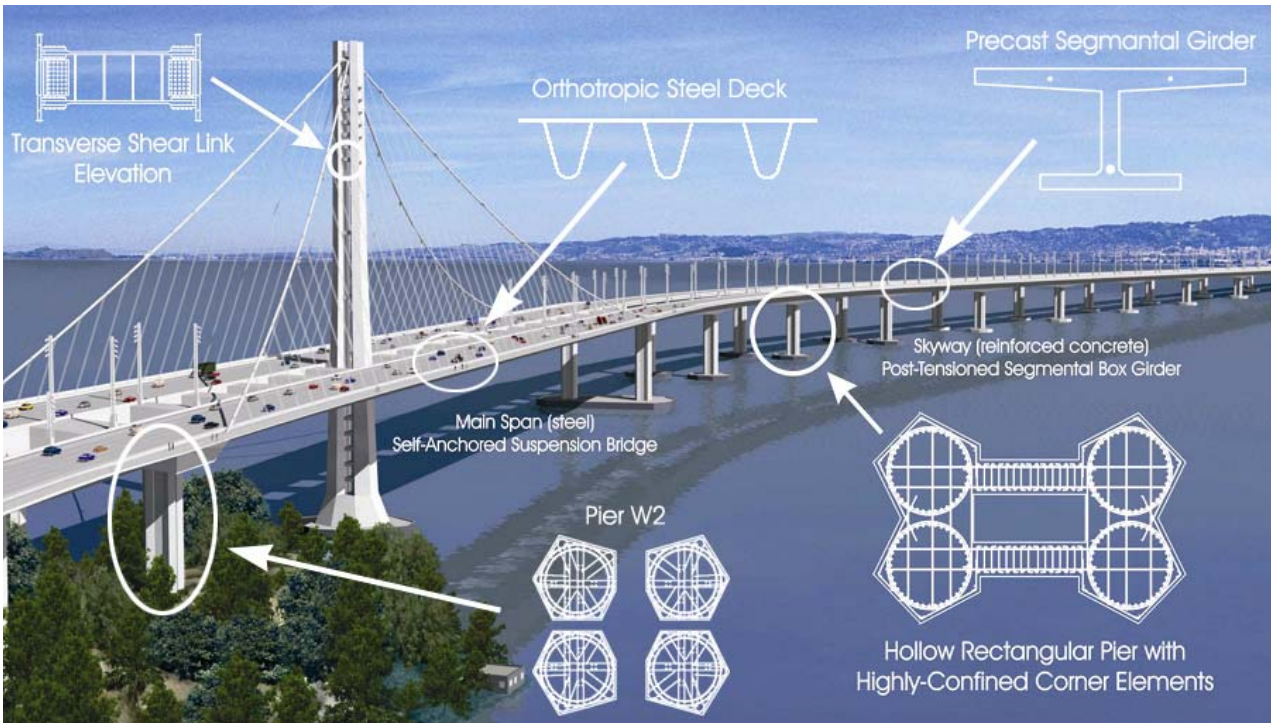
Rendering of the new East Spans of the San Francisco-Oakland Bay Bridge and of the key structural components tested in the Charles Lee Powell Structural Research Laboratories at the University of California, San Diego (original rendering: T.Y. Lin International).
